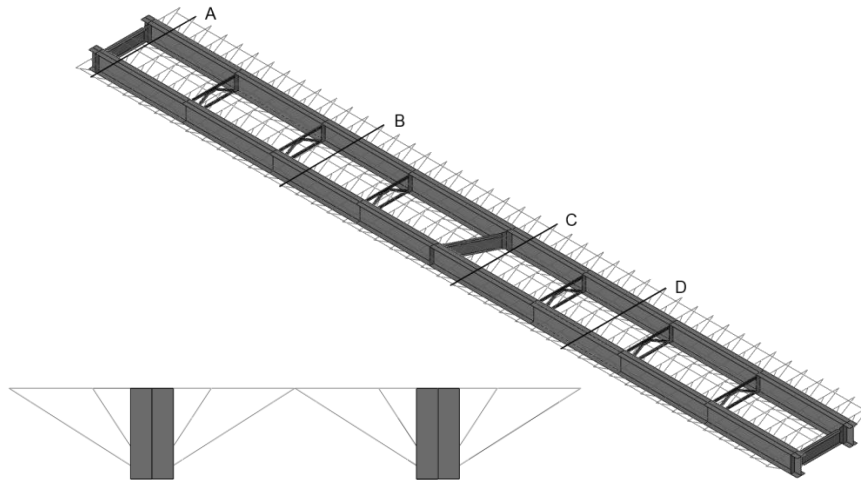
FE-model of Bridge over road E6 with formwork attached incl. cross-section
